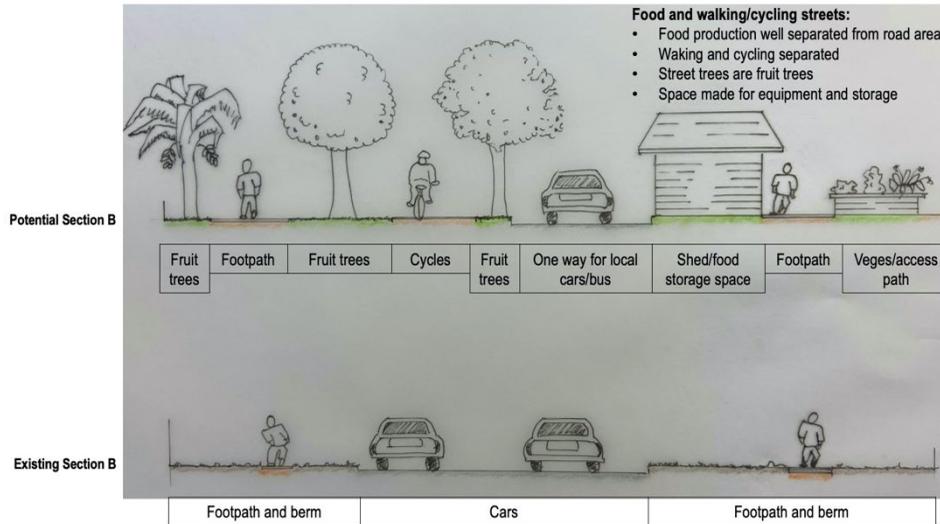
Cross section of proposed layout for a local or non-arterial road.
